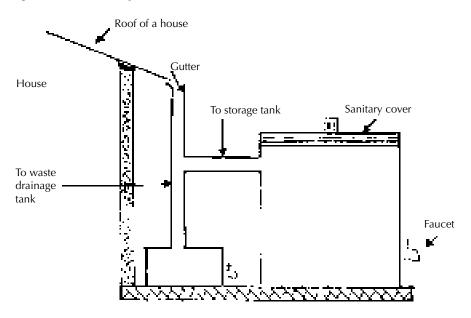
Sketch of a simple sanitary installation for collecting rainwater.
